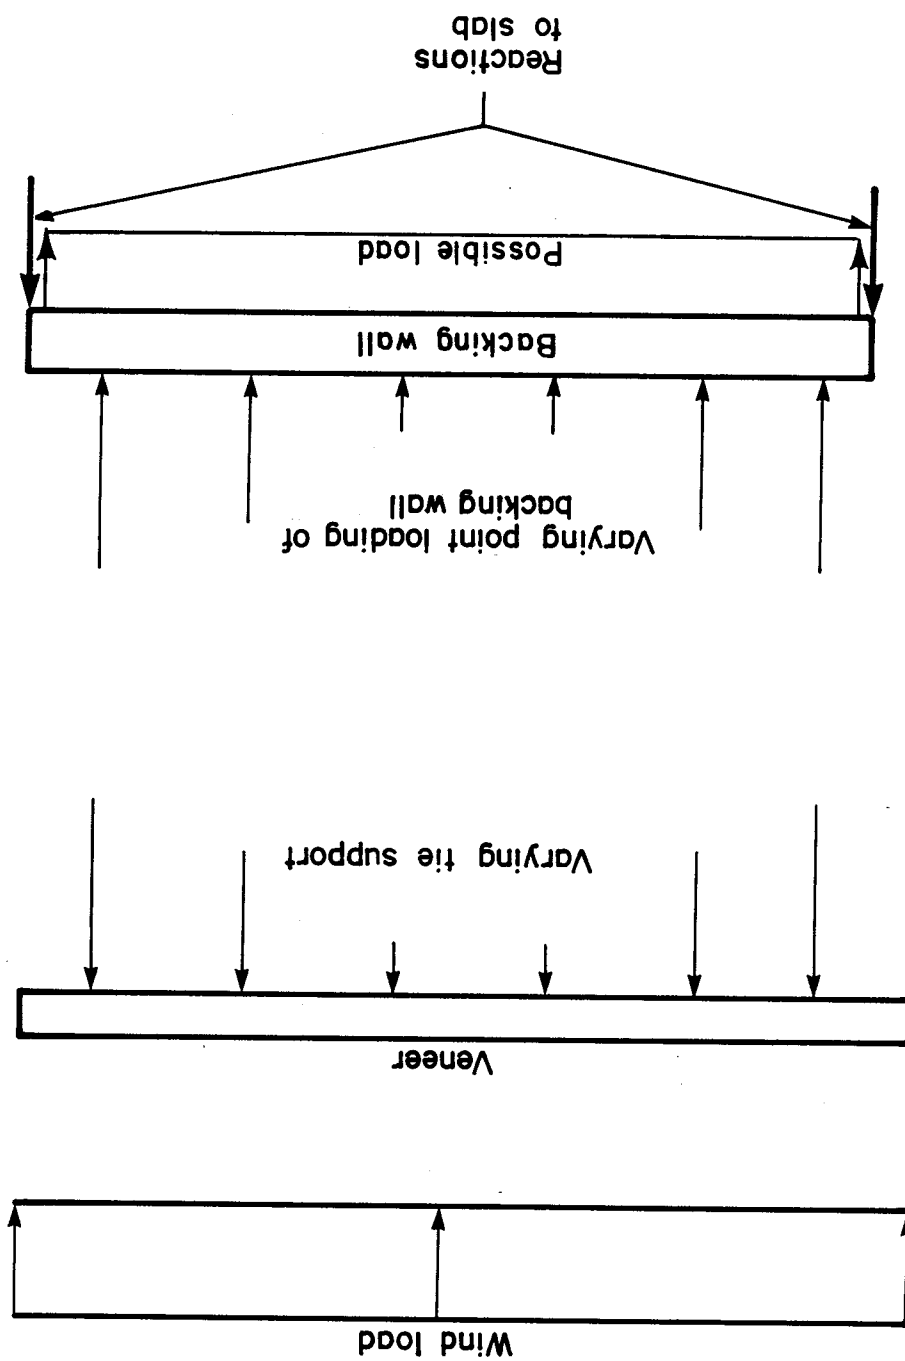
Load Carrying Mechanism of Masonry Veneer Wall Systems
